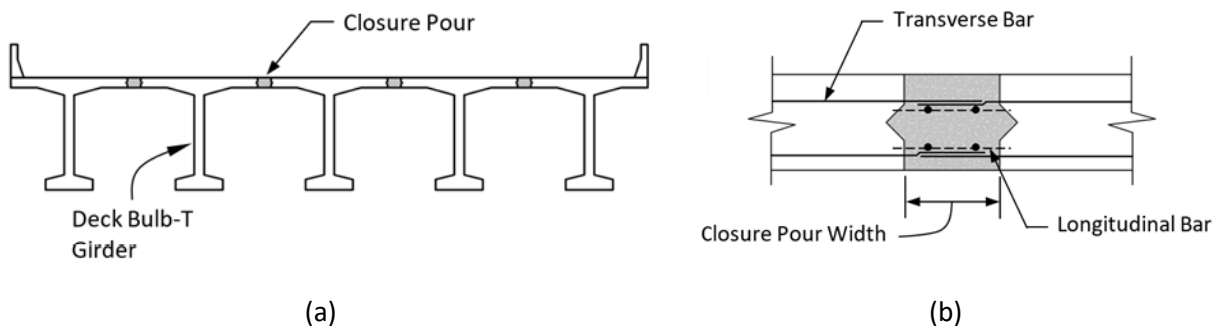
(a) Deck Bulb-T girders, and (b) closure pour detail (Shokrgozar 2023).
